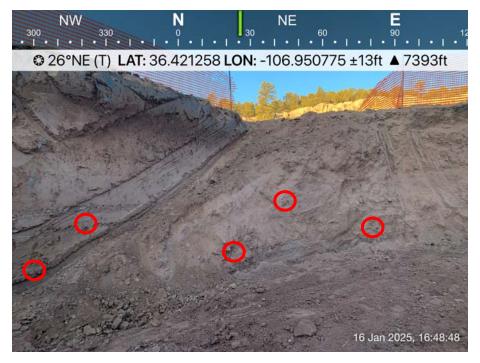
SS14 collected as a five-point composite sample 4-10 ft bgs from northeast sidewall of excavation.
